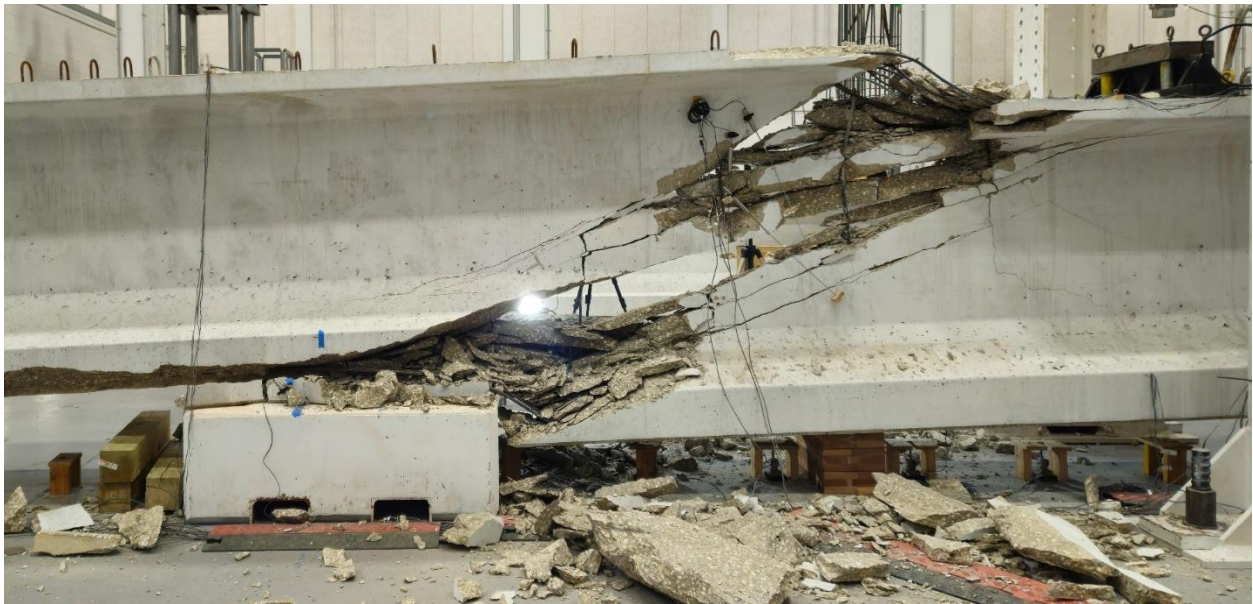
West side of G7 girder at cracking load.
